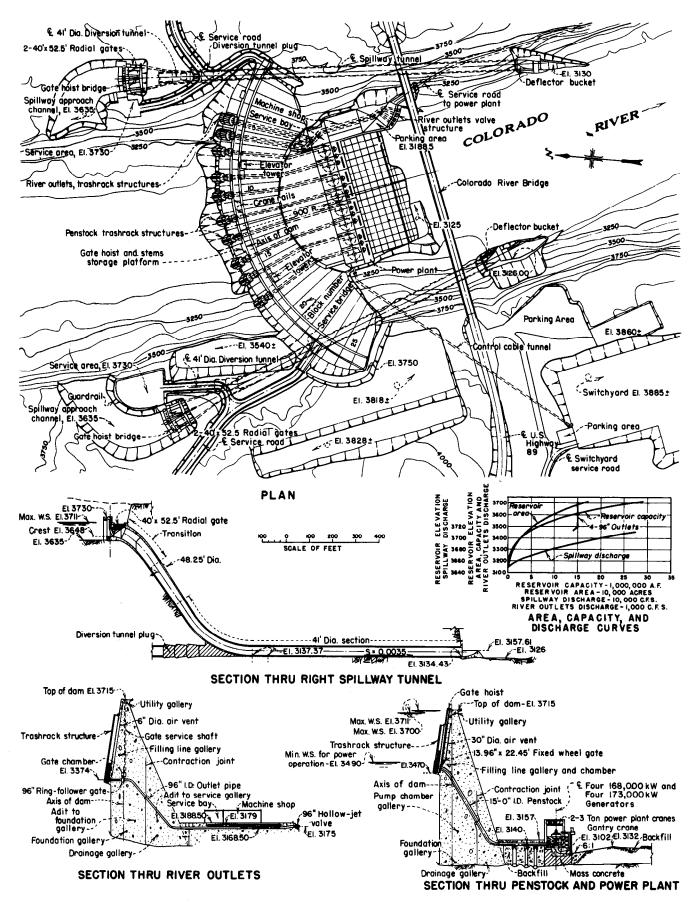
Glen Canyon Dam and Powerplant, plan and sections.
